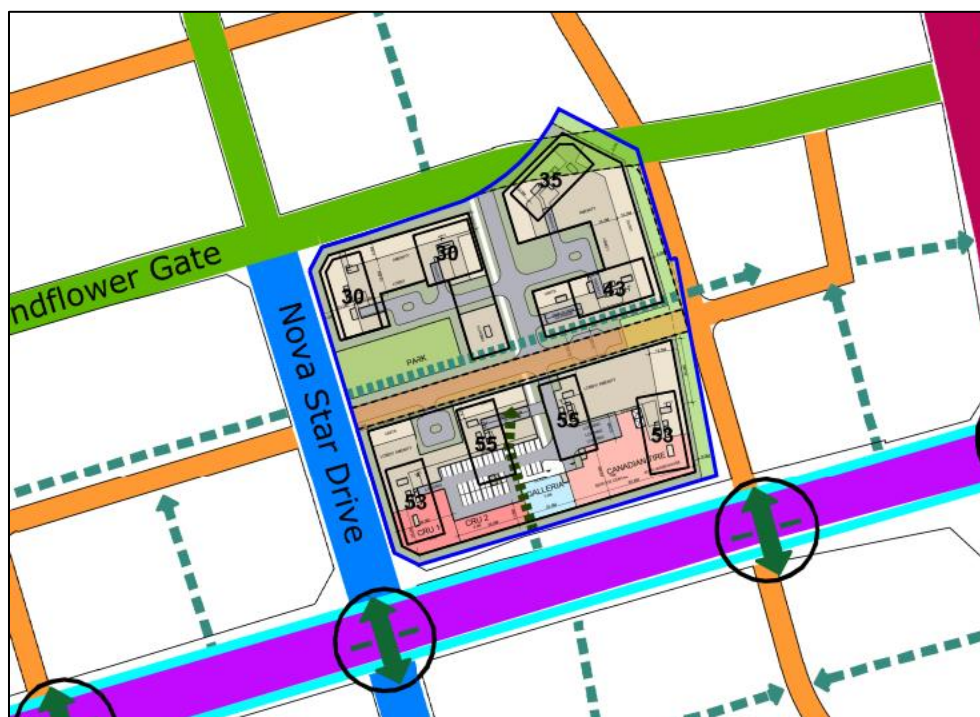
Site Plan Overlay on Weston 7 Secondary Plan Schedule 4 – Transportation System
